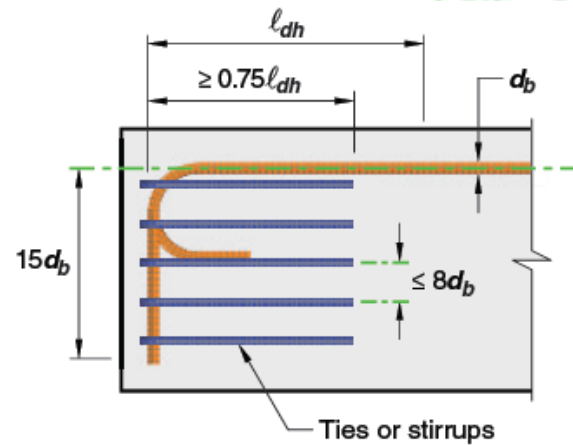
Confining reinforcement placed parallel to the bar being developed that contributes to anchorage strength of both 90- and 180-degree hooked bars.
